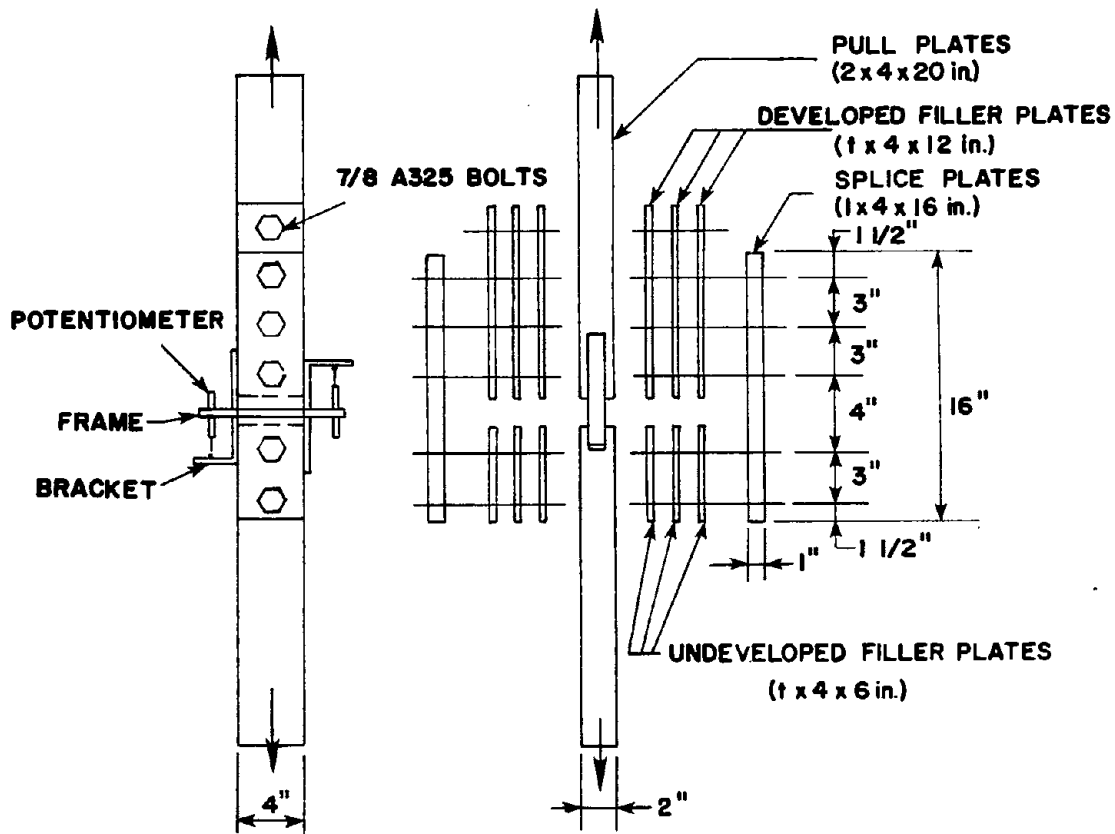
Test specimen and instrumentation (1 in. = 25.4 mm)
